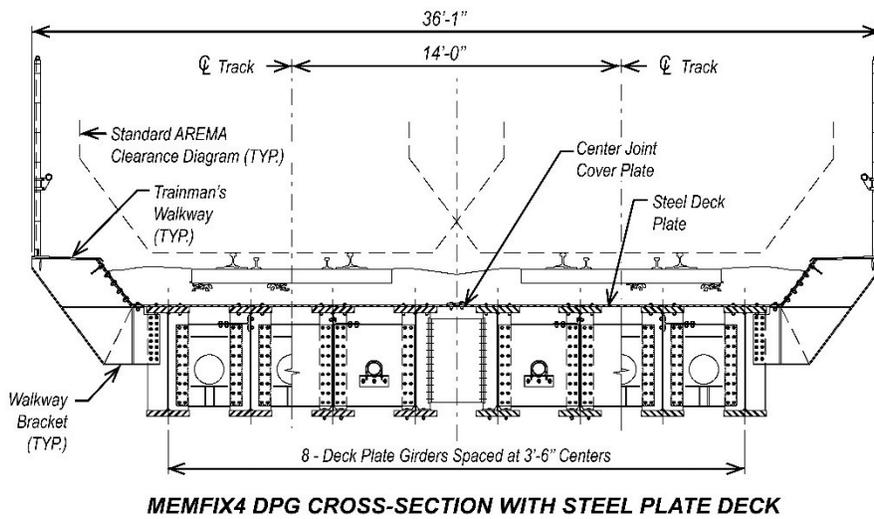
MemFix4 NSR bridge deck plate girder cross-section
